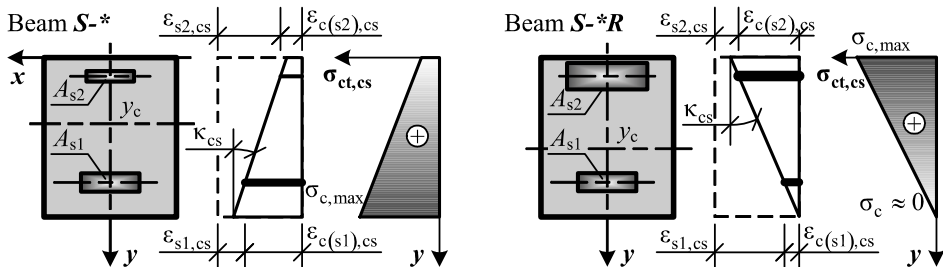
The distribution of shrinkage strains and stresses across the section of the beam specimens
